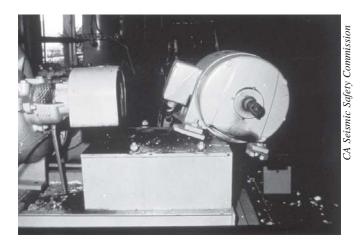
This motor slid out from under the heads of the bolts holding it down. Tight bolts installed in holes—rather than slots—in its base would have held it in place.
